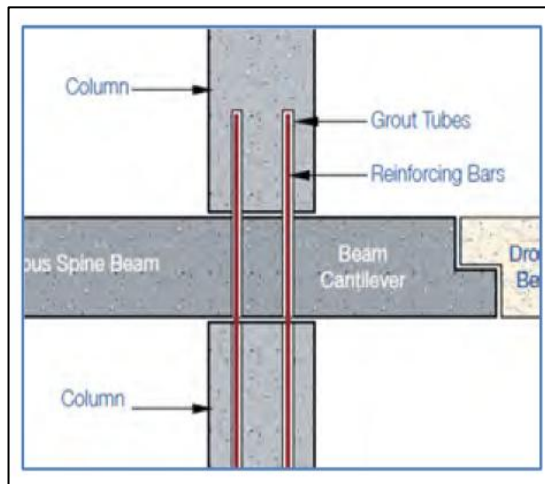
shows how the projecting bars are used to ensure a connection between a column and a continuous beam in a precast concrete building.
